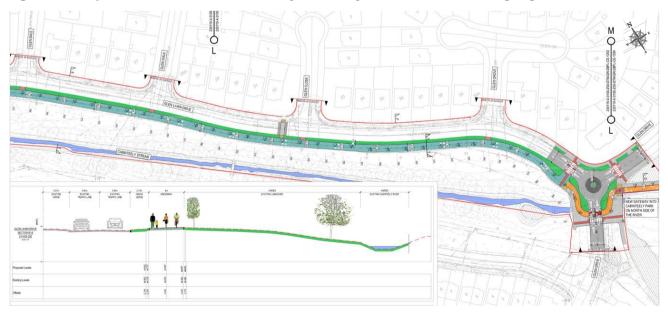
Proposed Section B(2) of Cabinteely Greenway (Source: DBFL Consulting Engineers)
